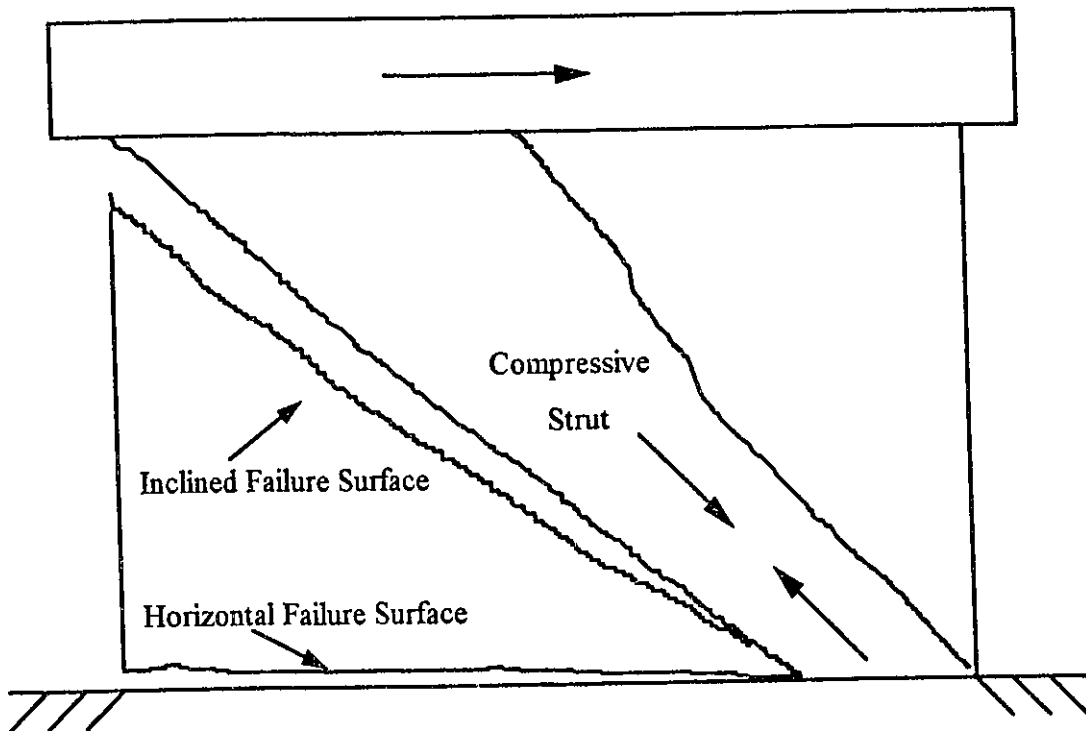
Potential Failure Planes for Low-Rise Shear Walls
